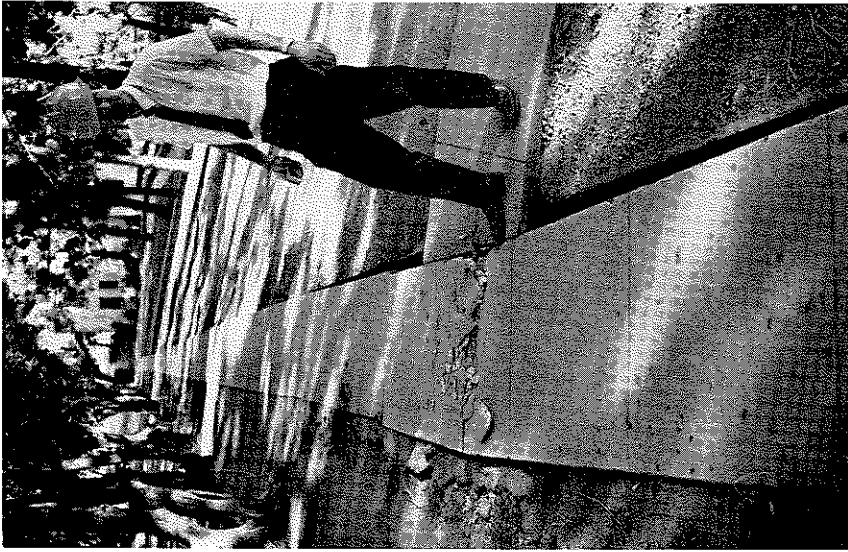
Sidewalk failure from ground movements near Infirmary Building (Bldg. 41), Veterans Hospital.
